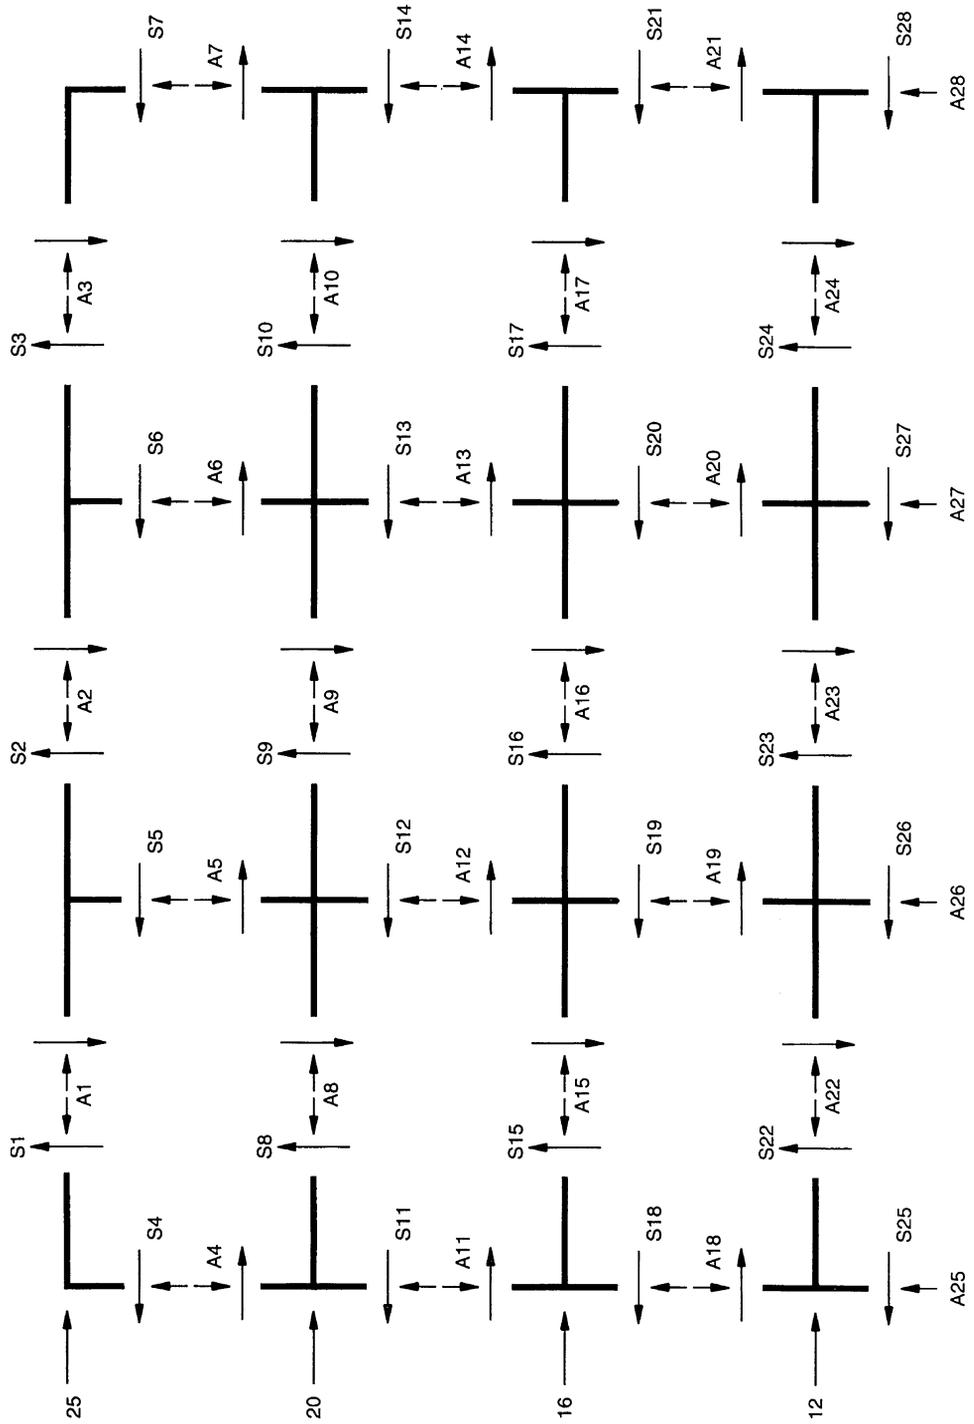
Cantilever method of determining the forces at midspan of beams and midheight of columns in the frame of Fig. 8.16.
